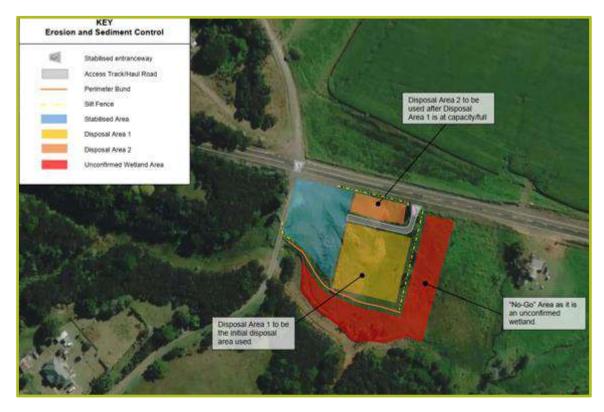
Excerpt from CLL Erosion & Sediment Control Plan, which also indicates "no go" zone in and around a natural inland wetland. *Note that fill was not disposed on the site despite the notations on the plan.* (Source: CLL Contractors)
